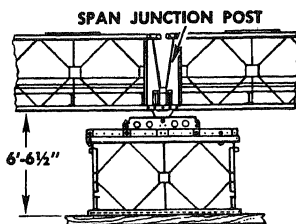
Single-story single-bay crib with panels horizontal. Bridge broken over crib.
